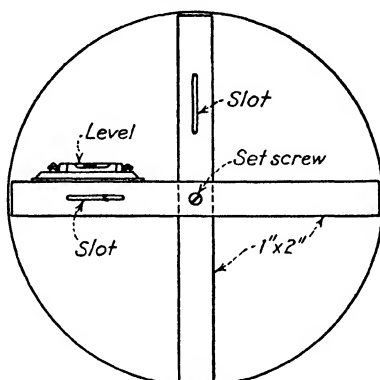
Sighting square for checking alignment of pipe in jacking.
